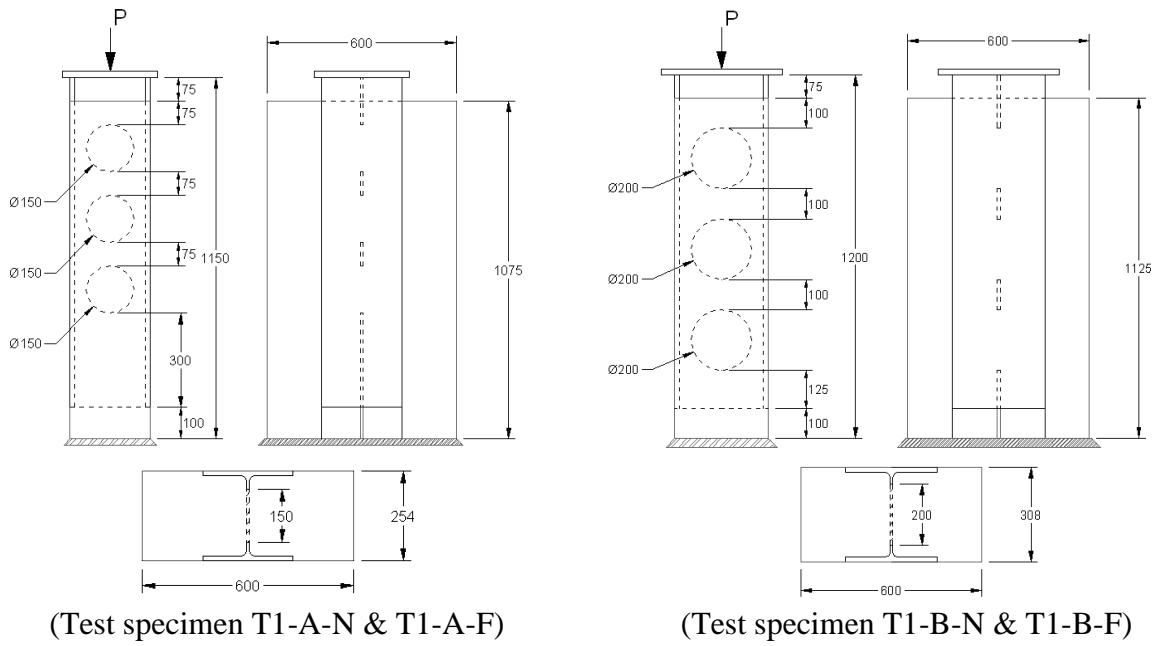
Test specimen of test group, T1, concrete-infill-only shear connection
